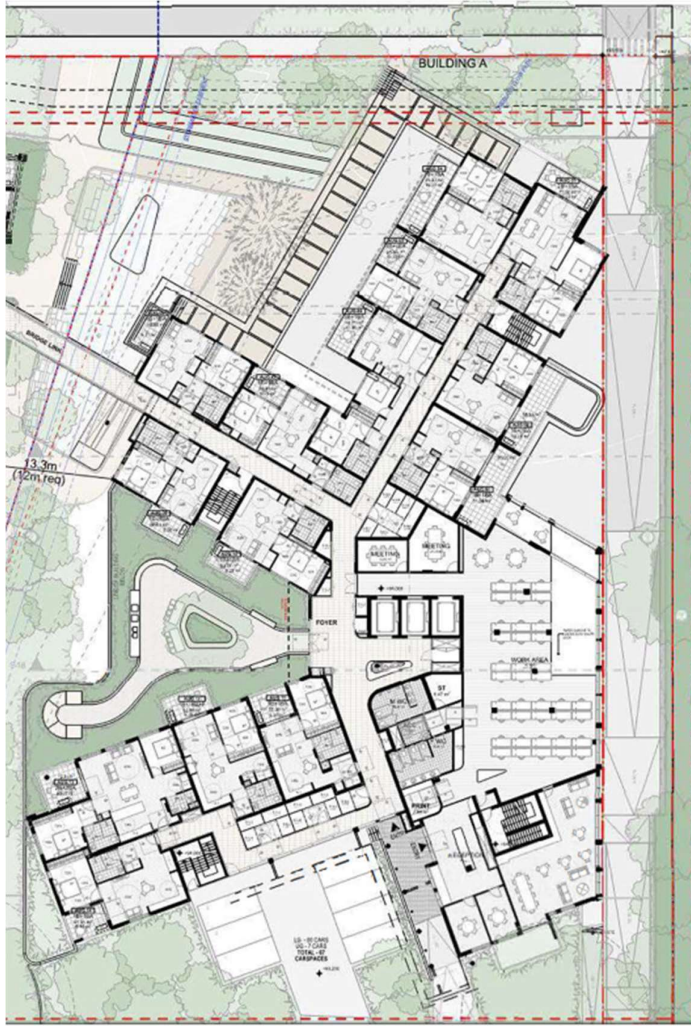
Approved and Proposed Upper Ground (UG) of Building A (3 of 3)
